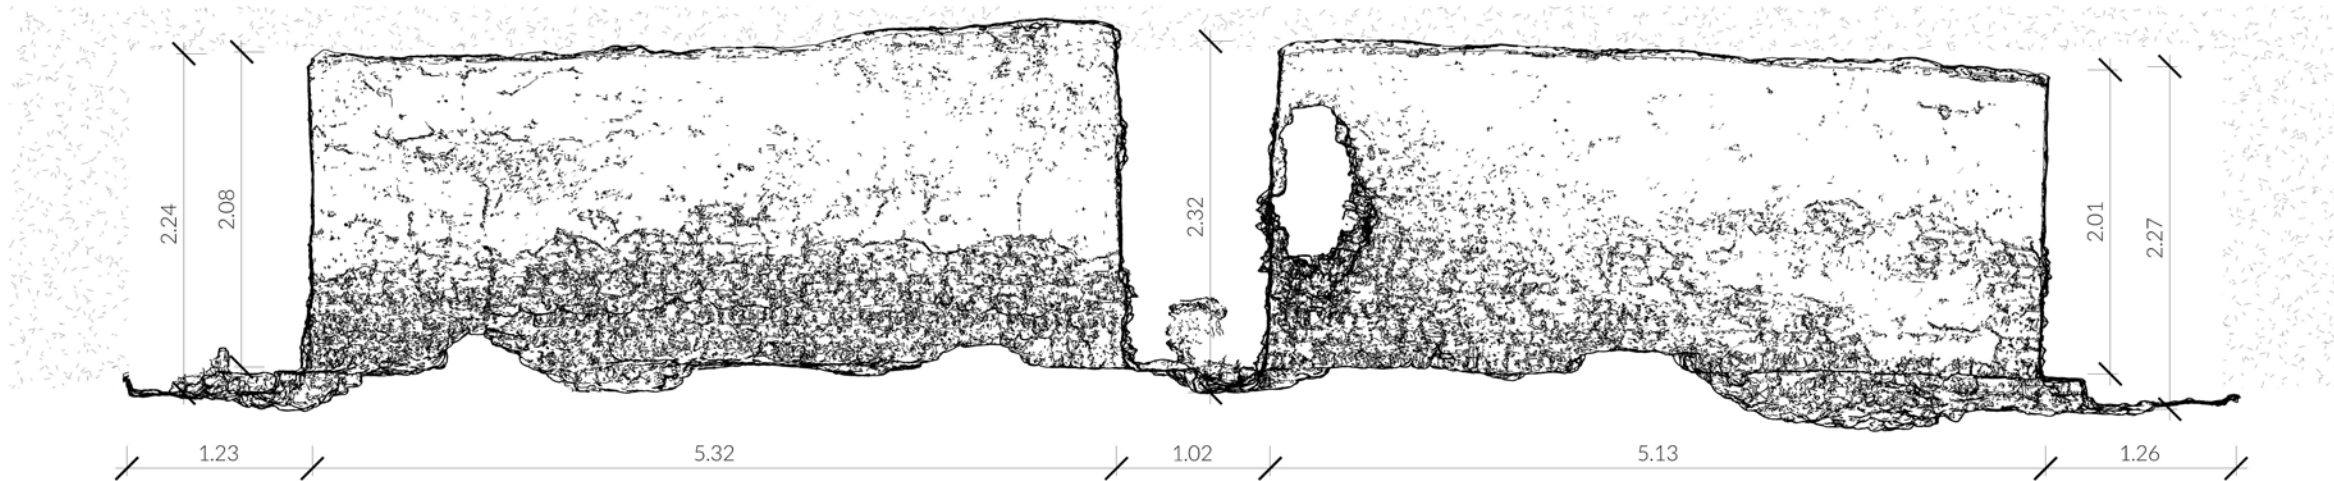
Section through YKK1 - YKK2, west walls, 1: 50
